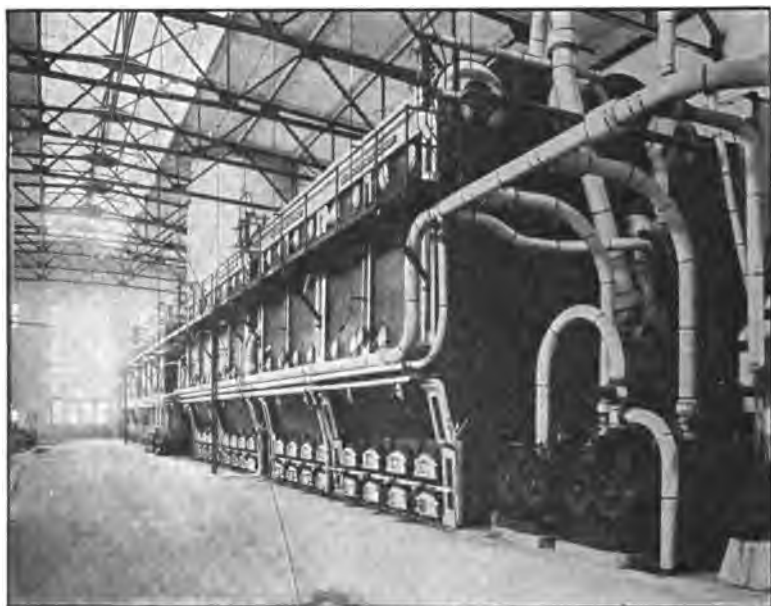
Same view of boiler plant when completed, showing auxiliary apparatus and steam piping.
